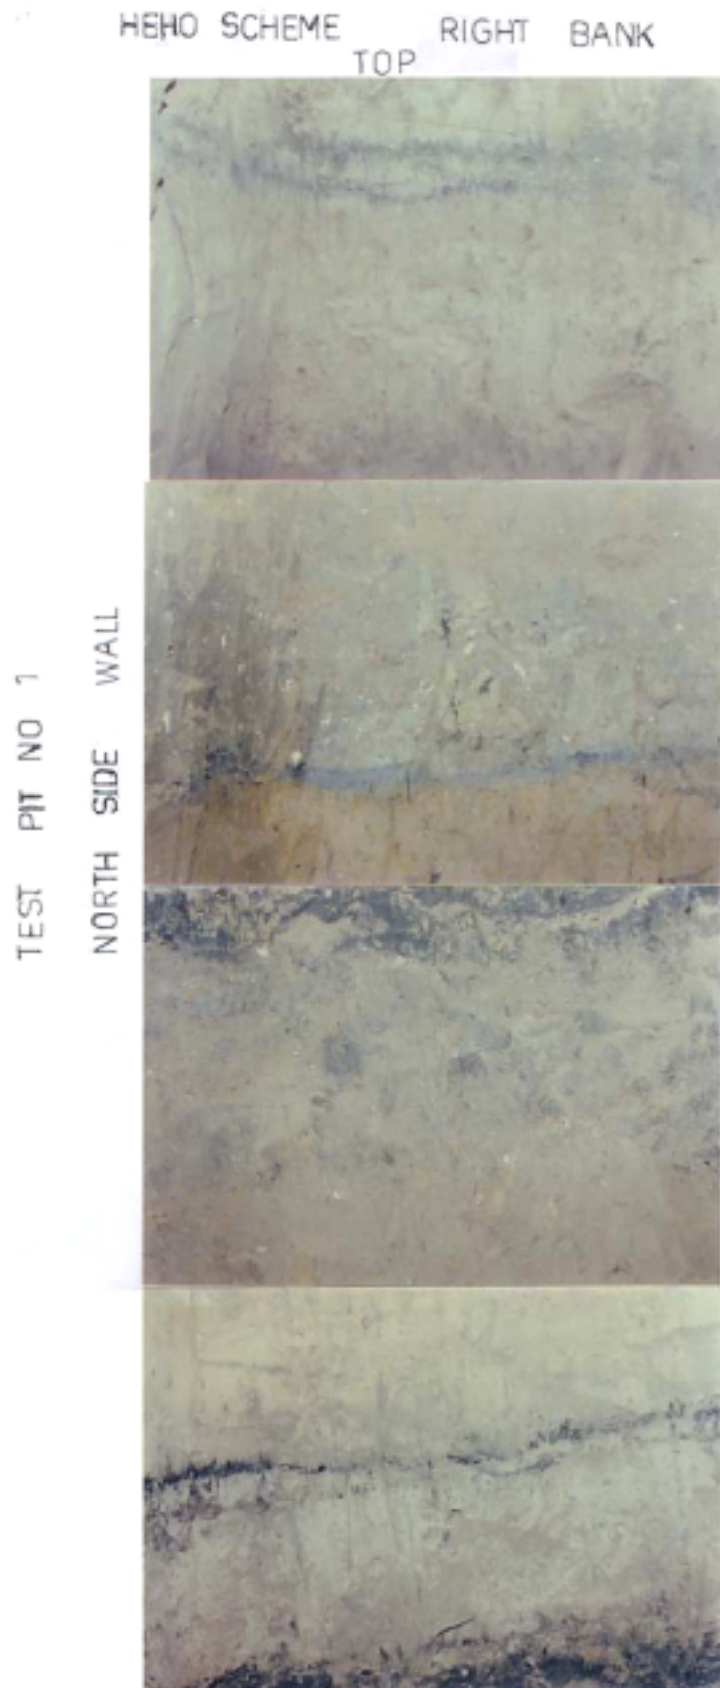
Photograph of Right Bank Test Pit No.1 (3/3)
